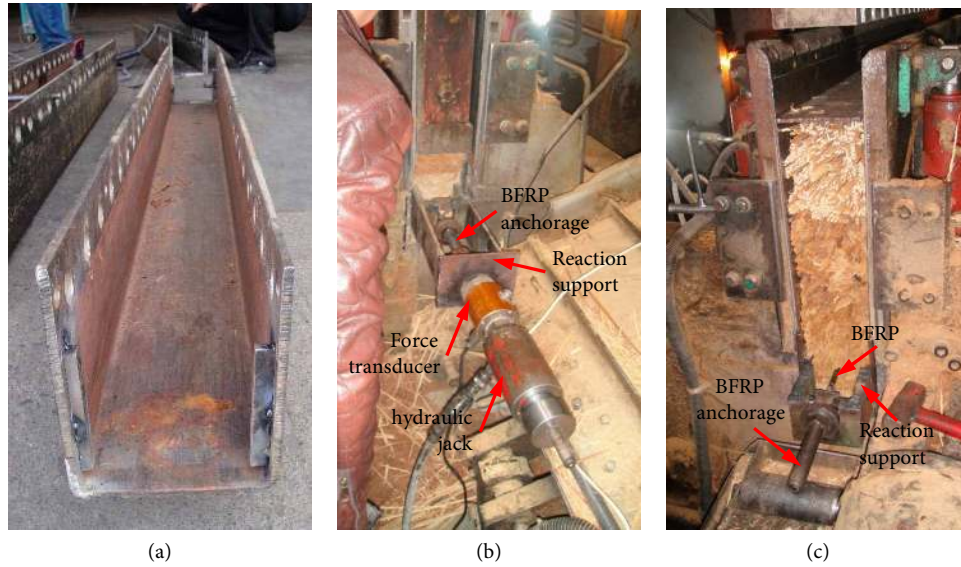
Prestressing tension system: (a) steel mould for bamboo beam, (b) tensioned end, and (c) fixed end.
